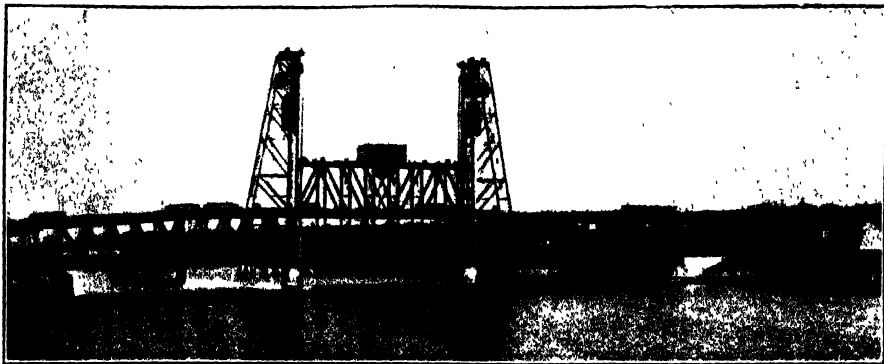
O.-W. R. R. and N. Co.'s Bridge over the Willamette River at Portland, Ore.—Lifting Deck and Lifting Span Down.
